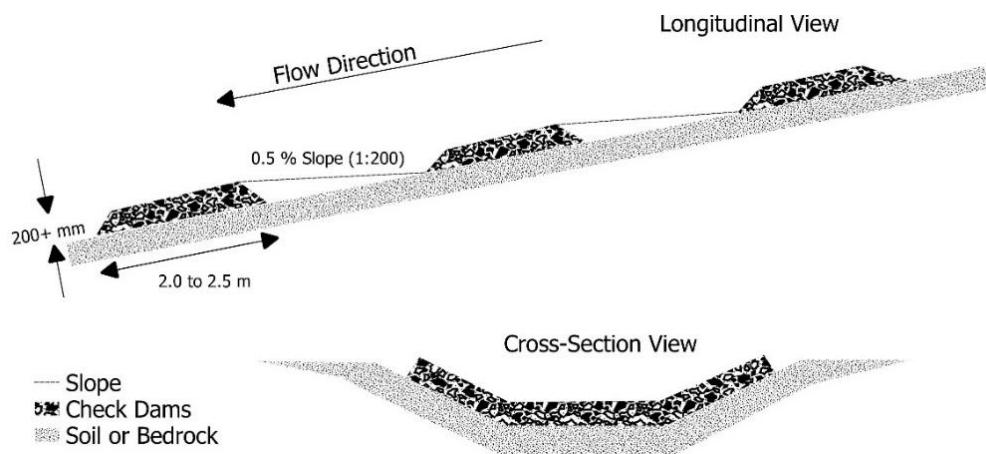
Longitudinal section and cross-section of a table drain with check dams.
